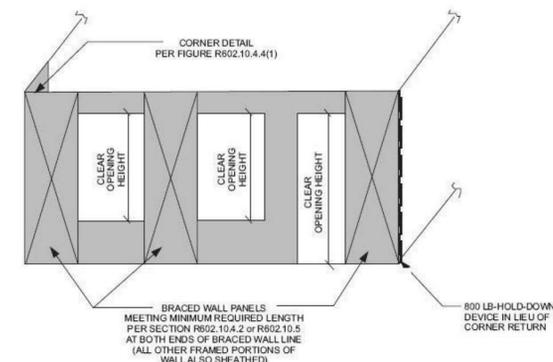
(3) BRACED WALL LINE WITH CONTINUOUS SHEATHING WITHOUT CORNER RETURN PANEL
